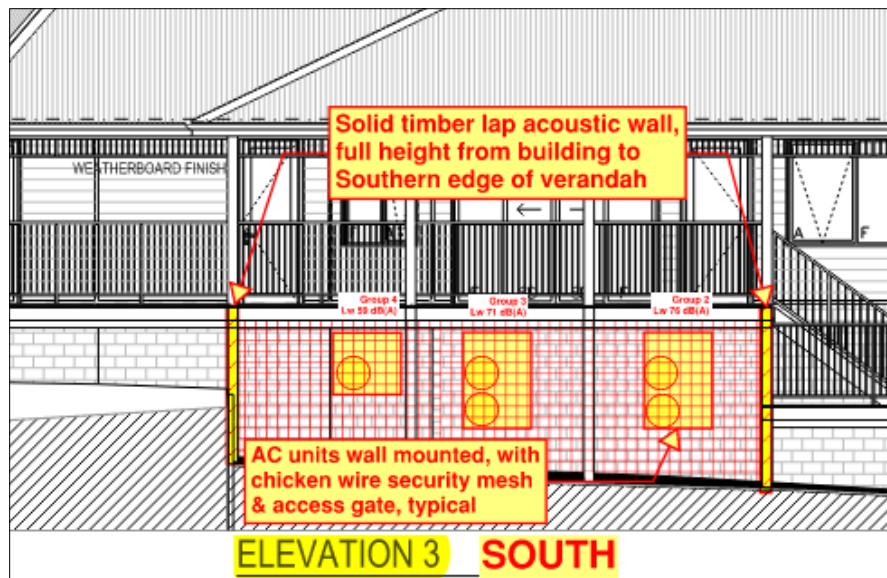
AIR CONDITIONING – GENERAL ARRANGEMENT SOUTH
